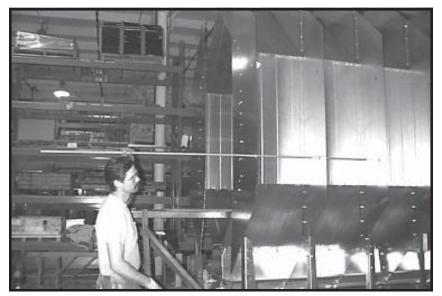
Inserting EMT conduit, column hi-limit through knockout on column end panel.
